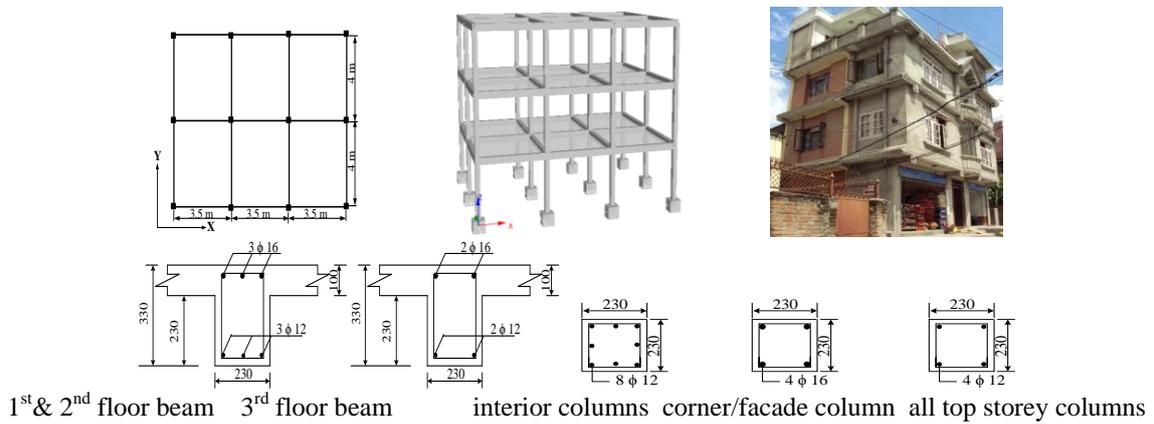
Plan, tridimensional model, and cross-section detailing of building model RC2
